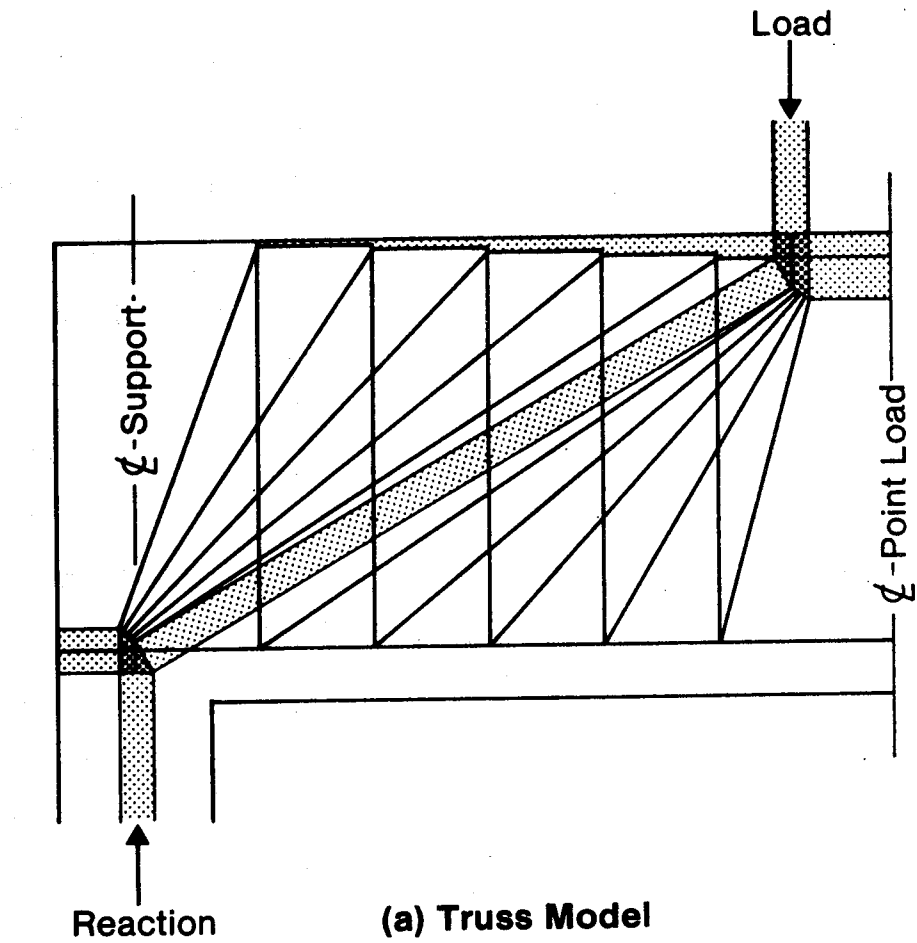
Plastic Truss for Beam 1/1.5 N
